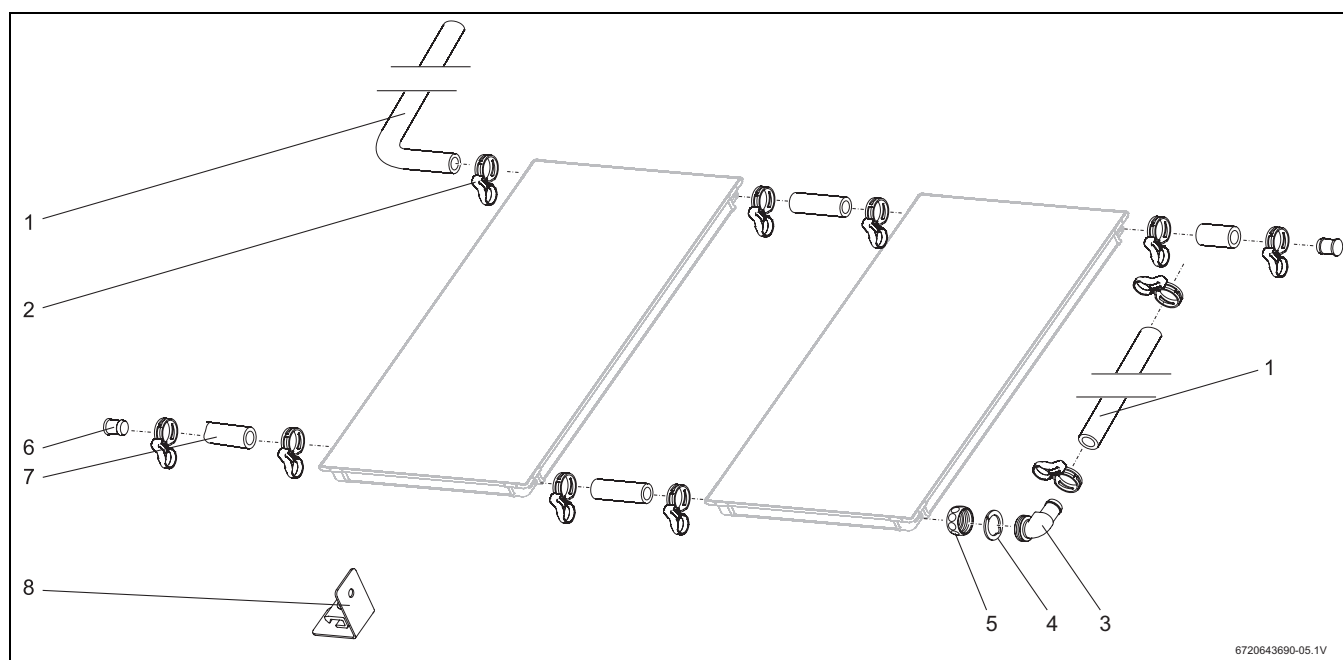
Connection set and joining set (shown with 2 vertical collectors)
